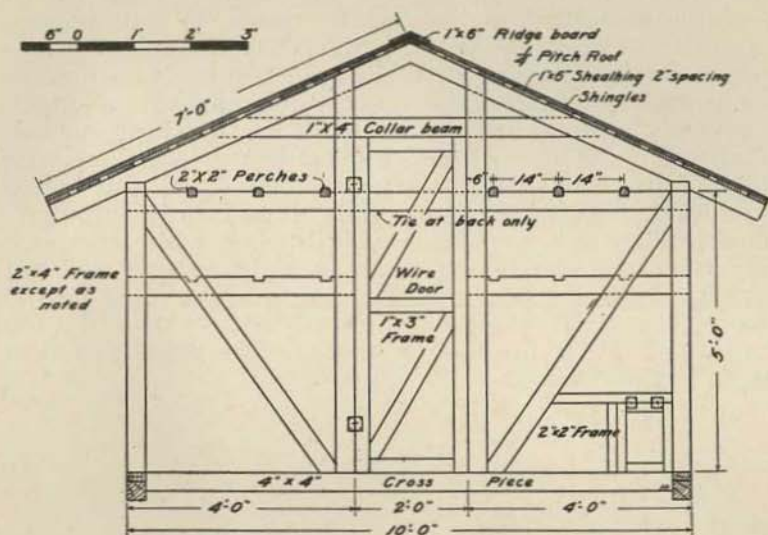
END ELEVATION. OPEN AIR RANGE HOUSE.
